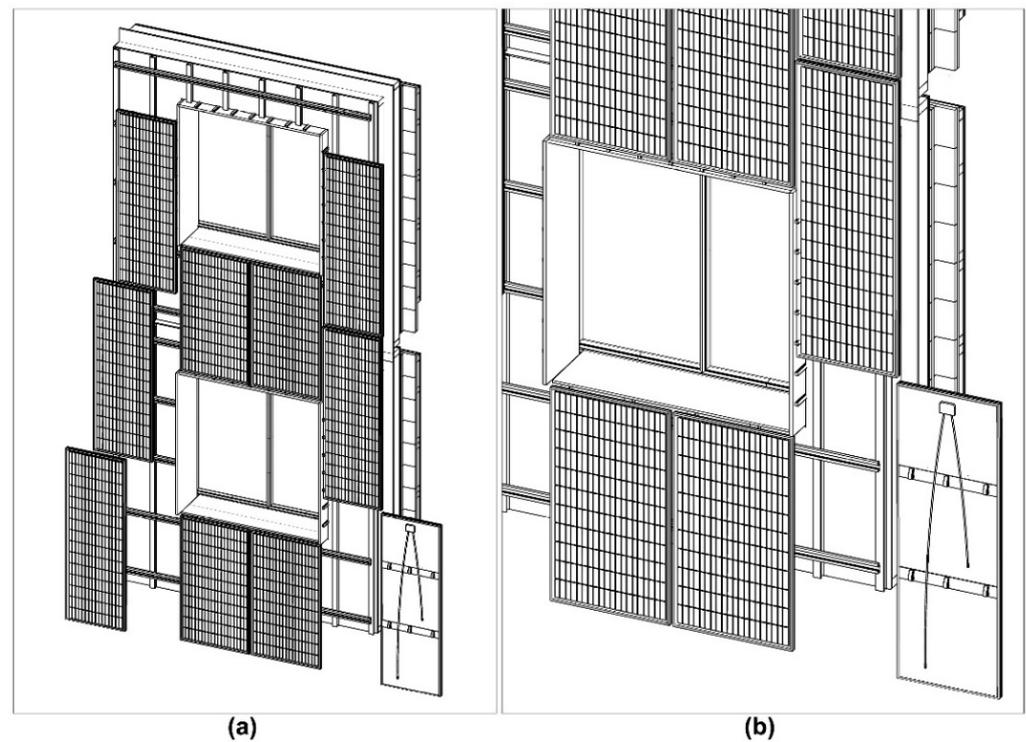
Overview (a) of the mounting system for BIPV façade modules on two prefabricated façade components of the building renovation system with finally positioned modules, modules before mounting on horizontal rails (two modules on the bottom left), and module back elevation with illustration of connection anchors, electricity connectors, and cabling (module on the bottom right), and detailed illustration (b).
